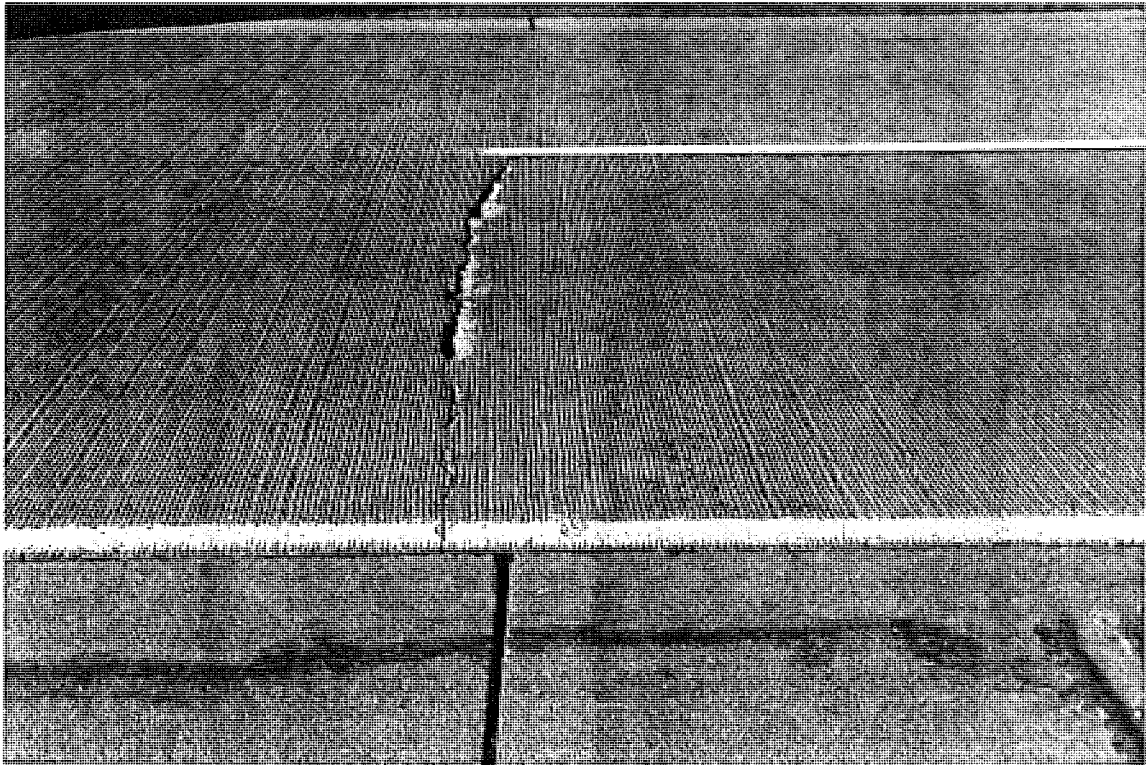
A full width transverse crack on CSN# 44044-18804A WB. The crack is tight in the passing lane and is spalling in the truck lane. This crack, was induced by the intermediate shoulder joint.
